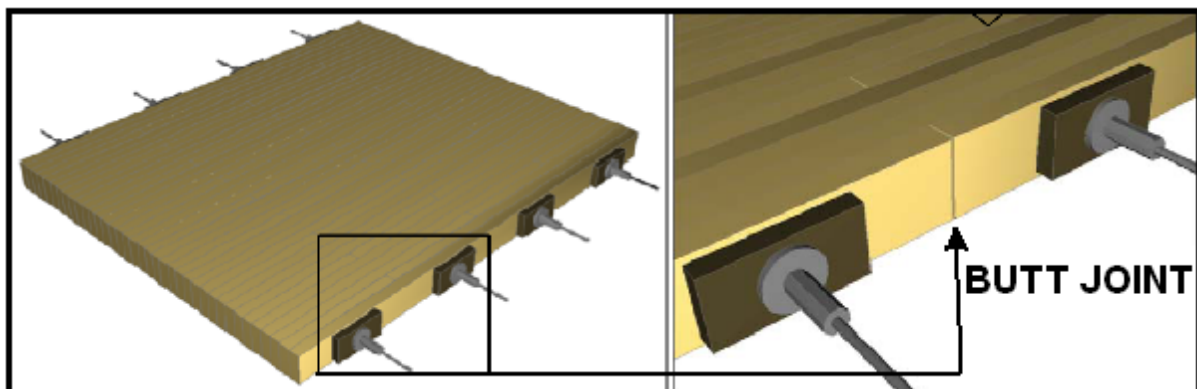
The principle of butt joints in SLTD. When a bridge deck is longer than the included laminations the laminations have to be jointed with butt joints.
